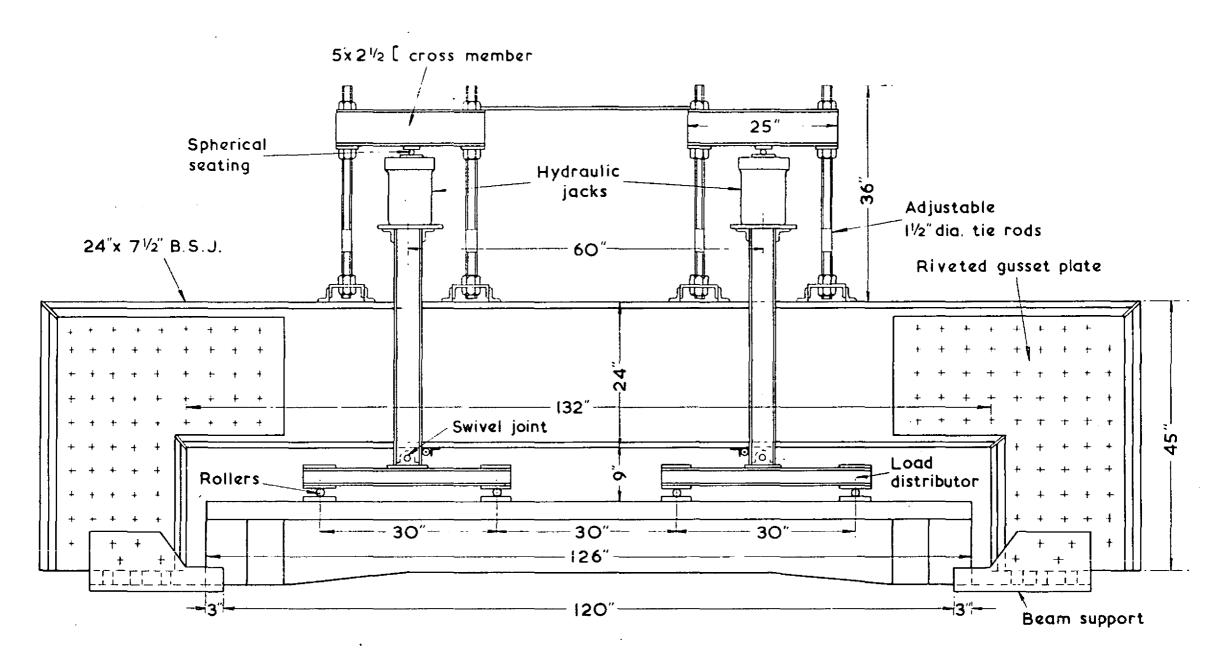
HYDRAULIC LOADING BRIDGE WITH FOUR POINT LOADING FOR 10'-0" BEAMS.
